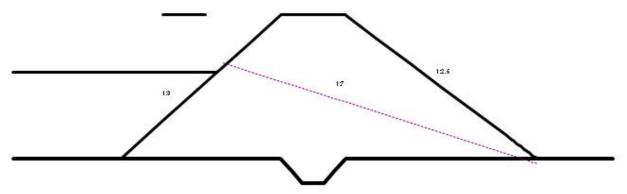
A typical Flood Protection Embankment for Abbassia (Kordufan, Sudan)
